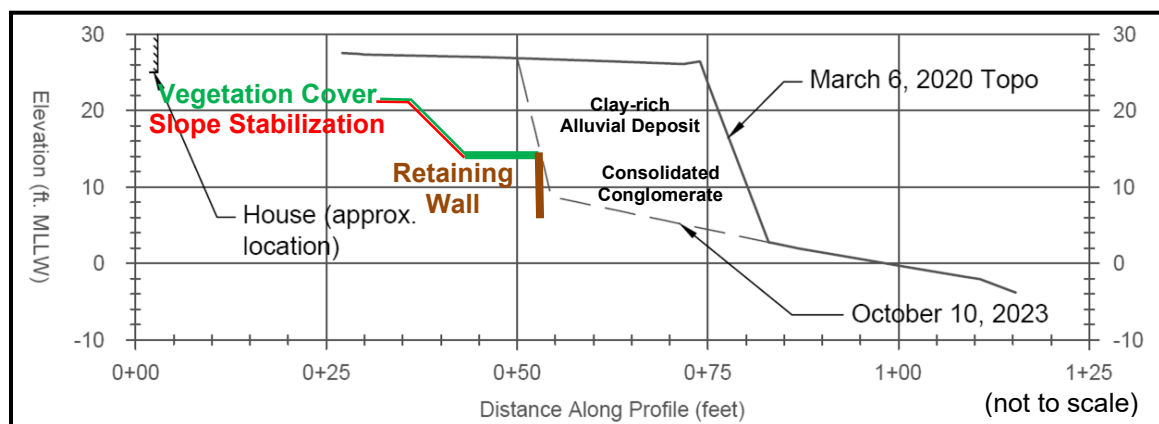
Concept for slope reconfiguration with a retaining wall
